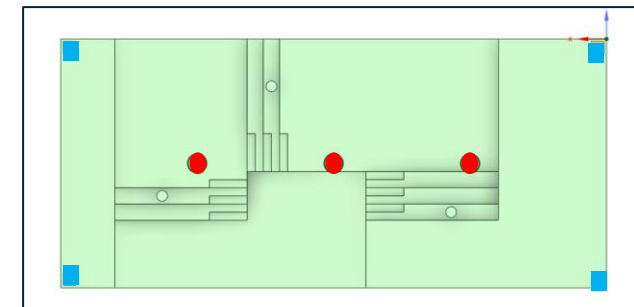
Ceiling SA +Ceiling RA (Ansys Fluent)
